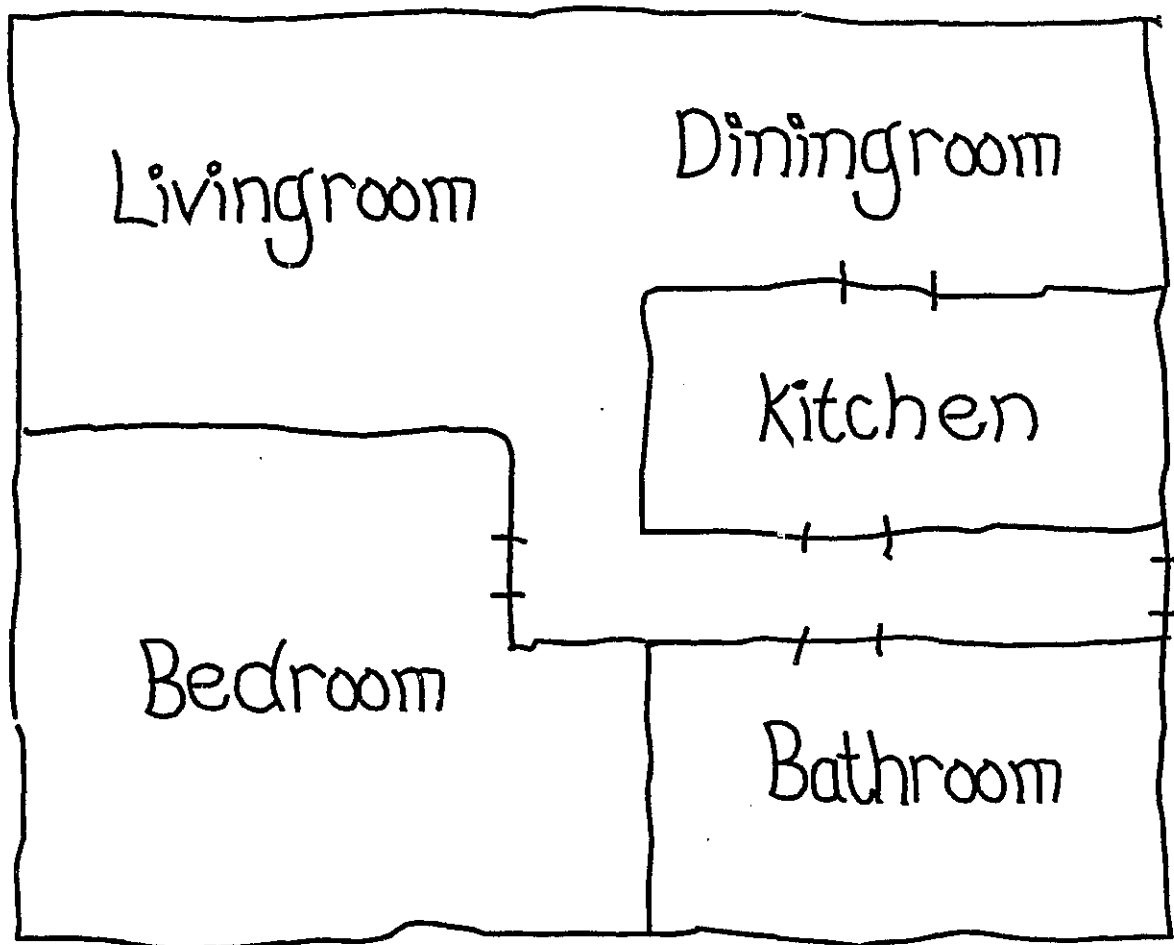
This sketch map was shown to subjects as an example of a hand-drawn floor plan of a home.
